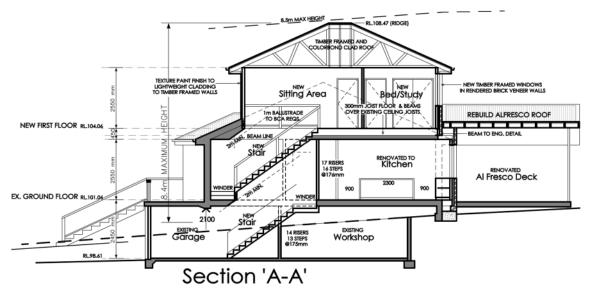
Section showing building height notations (maximum 8.3m from ground level, maximum 9.86m when measured from basement floor level)
